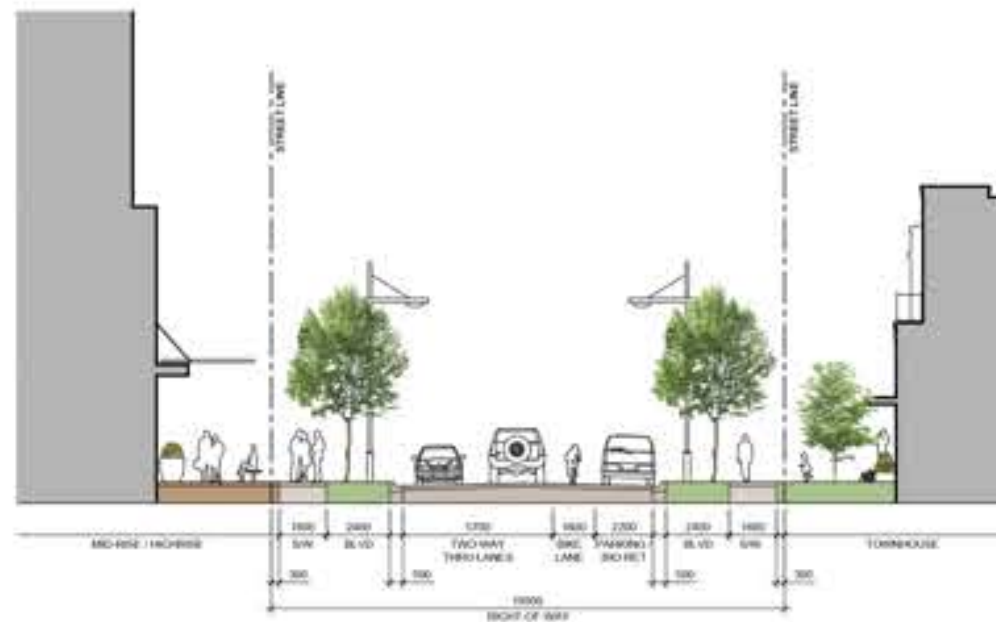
19.5m ROW - 2 thru lanes; on-street bike lanes; side walk on both sides of the street; on-street parking; and street trees in grass boulevard
